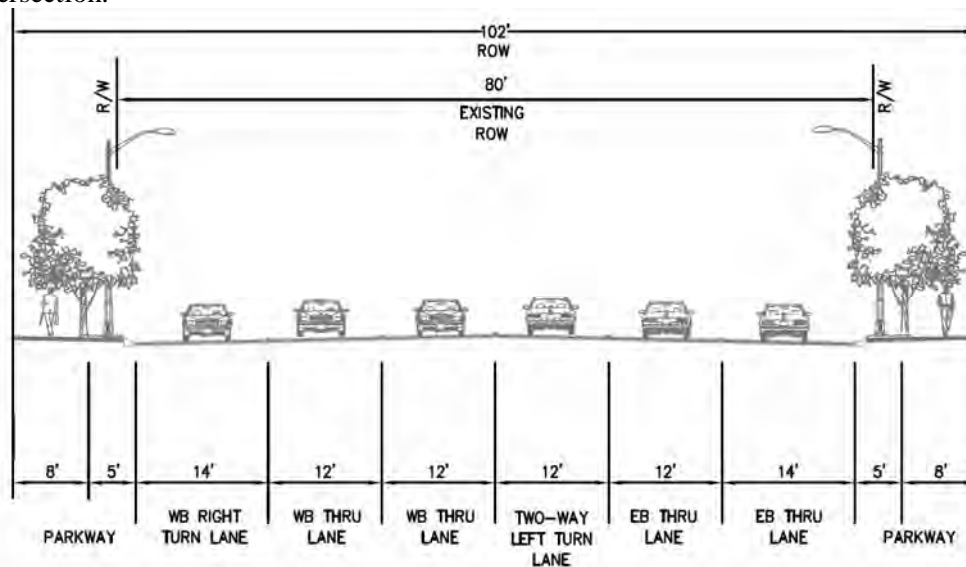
Proposed Cross Section, E Street Between I-5 and 300' East of I-5 N Ramp
